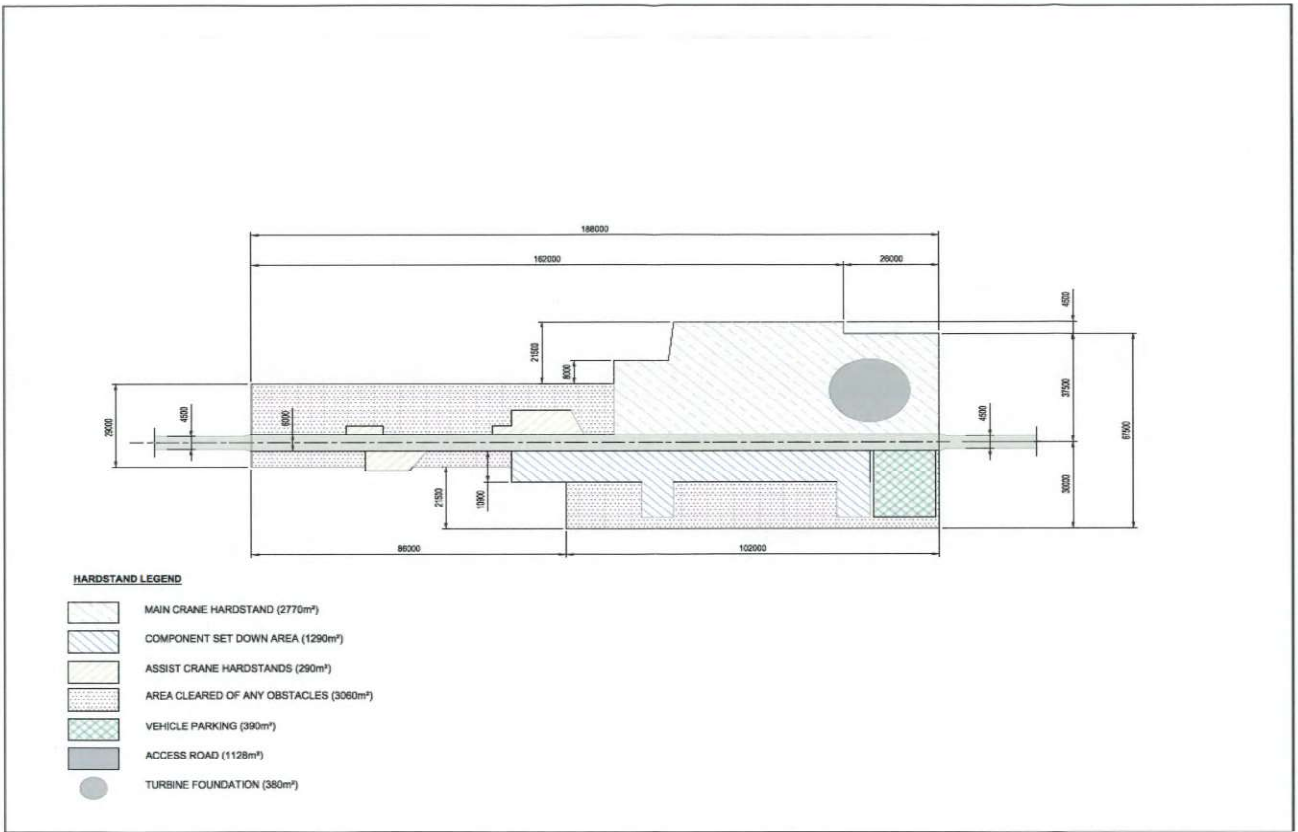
Crane Pad Hardstand Design (Excerpt from Drawing No. 6226-PL-601)
